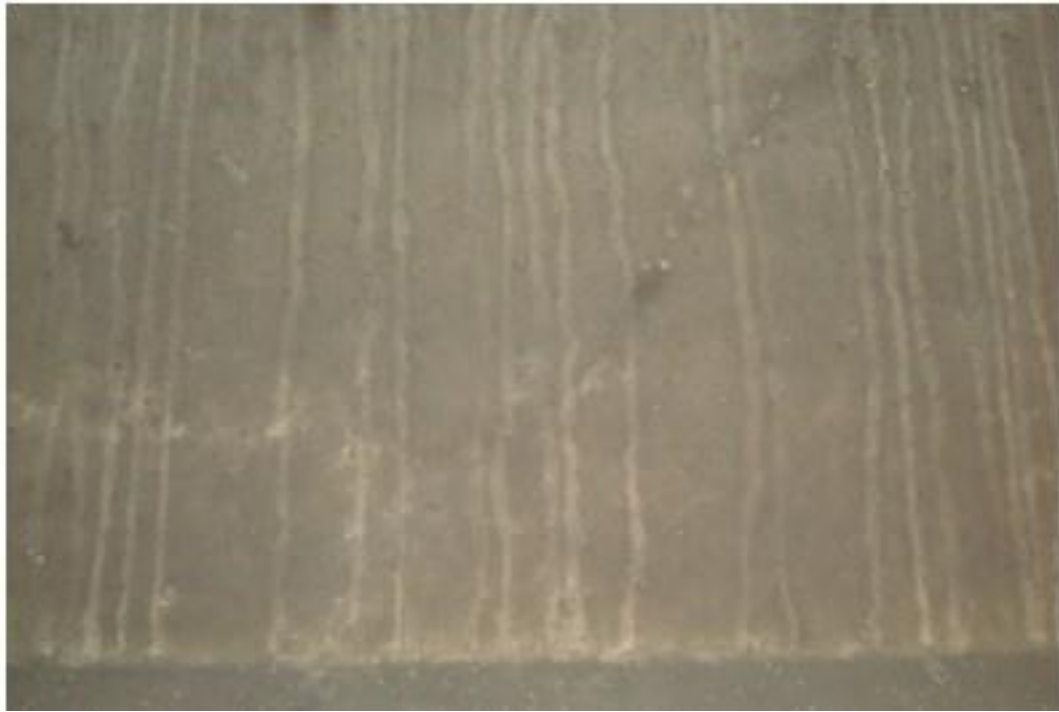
Cracks on south span girder, north end, 6th beam from east side, west face (#7933).
